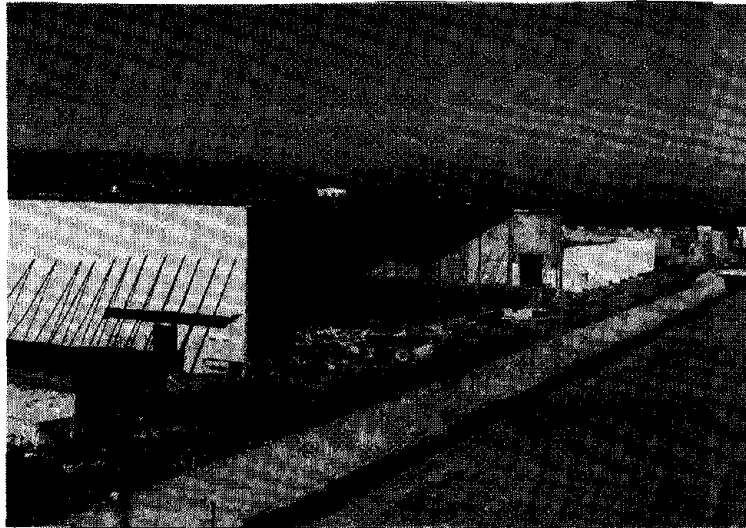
Damage of A Tilt-up Wearhouse in Northridge
